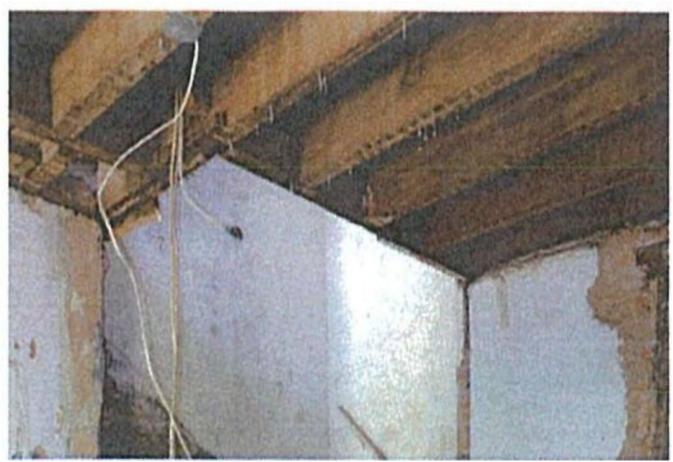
The stair header and the fireplace header are supported by a single member trimmer joist.
